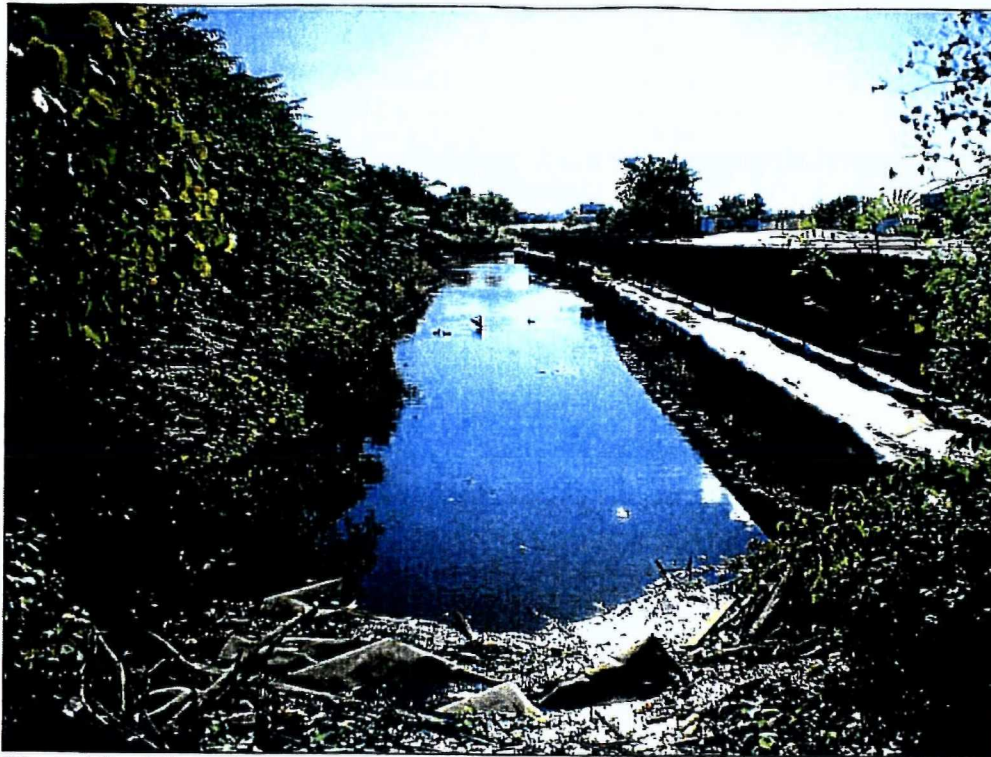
Photo K – View, facing southeast from Gotham Parkway, of Peach Island Creek and the existing bulkhead (right).
